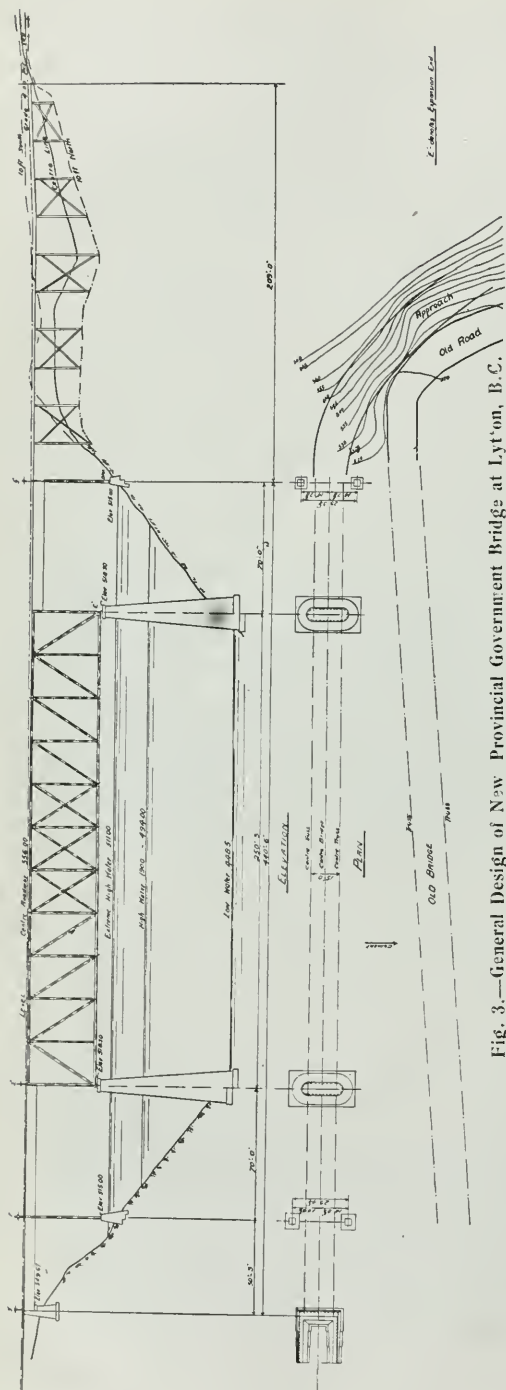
General Design of New Provincial Government Bridge at Lytton, B.C.
